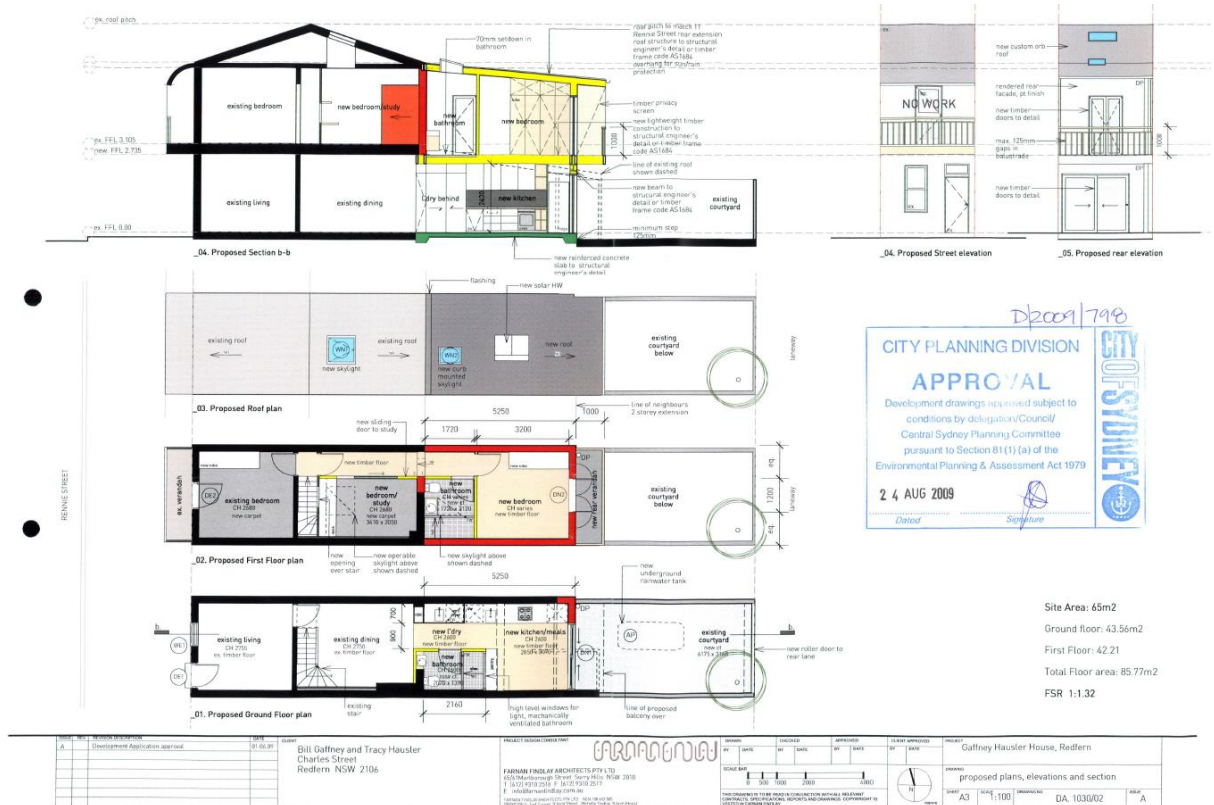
Stamped approved plan at No. 9 Rennie Street (D/2009/798)
